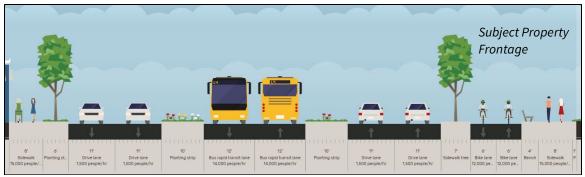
Ultimate 136 ft. Cross Section for Century Boulevard Looking North
